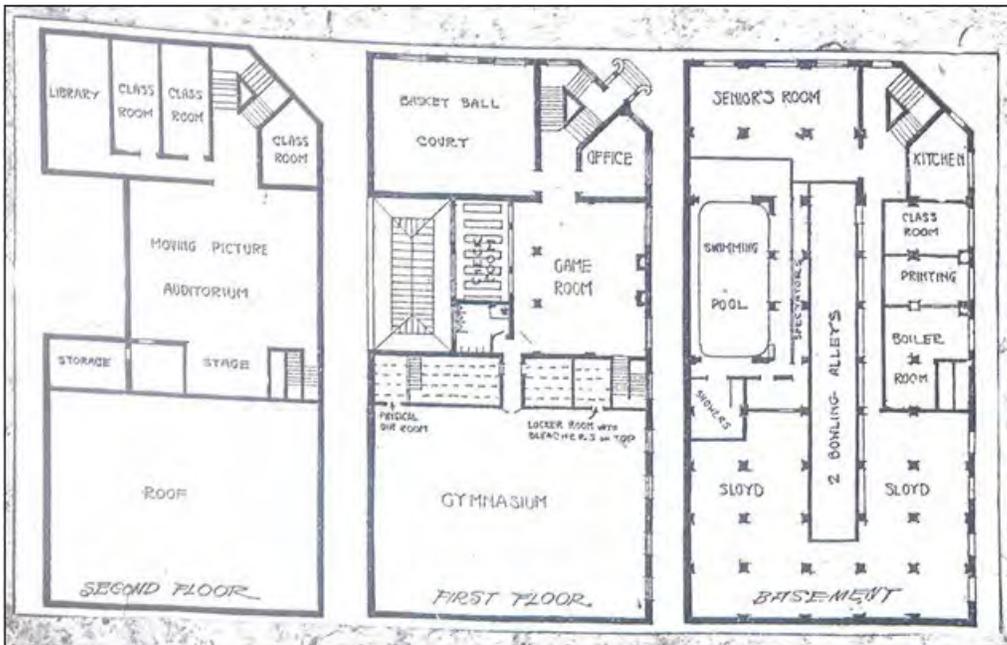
Conceptual Building Plan (not constructed according to plan). Syracuse Herald Journal. January 14, 1917. (Onondaga County Public Library)
